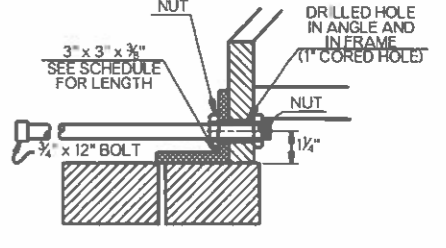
DETAIL OF CONNECTION FRAME & CAST IRON HOOD
